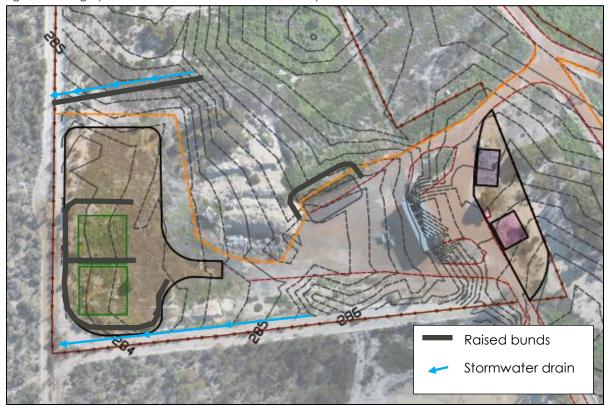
Pingrup Site stormwater control: Schematic plan
